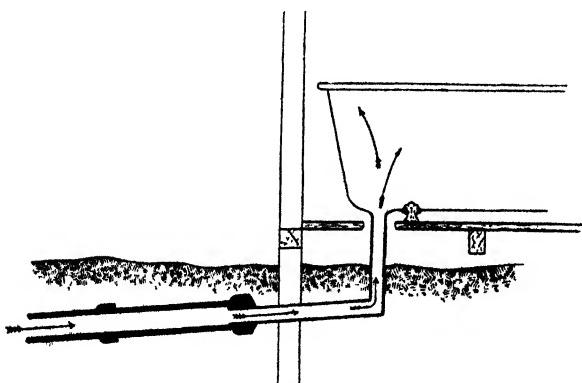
A waste pipe connected as above will convey sewer gas into the house.
